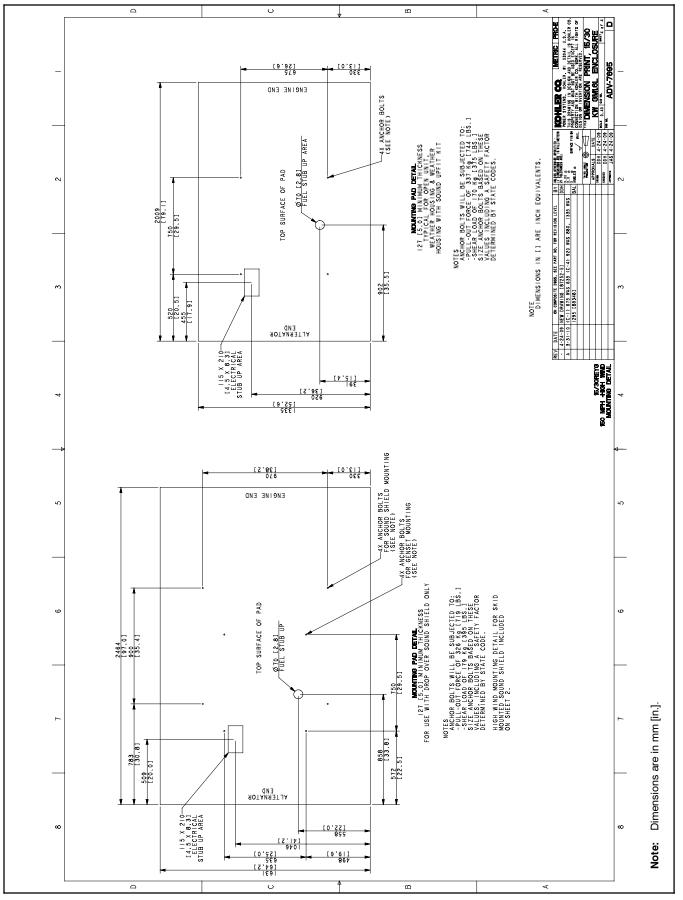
ADV-7695, Sheet 4, 150 MPH High Wind Mounting Details
